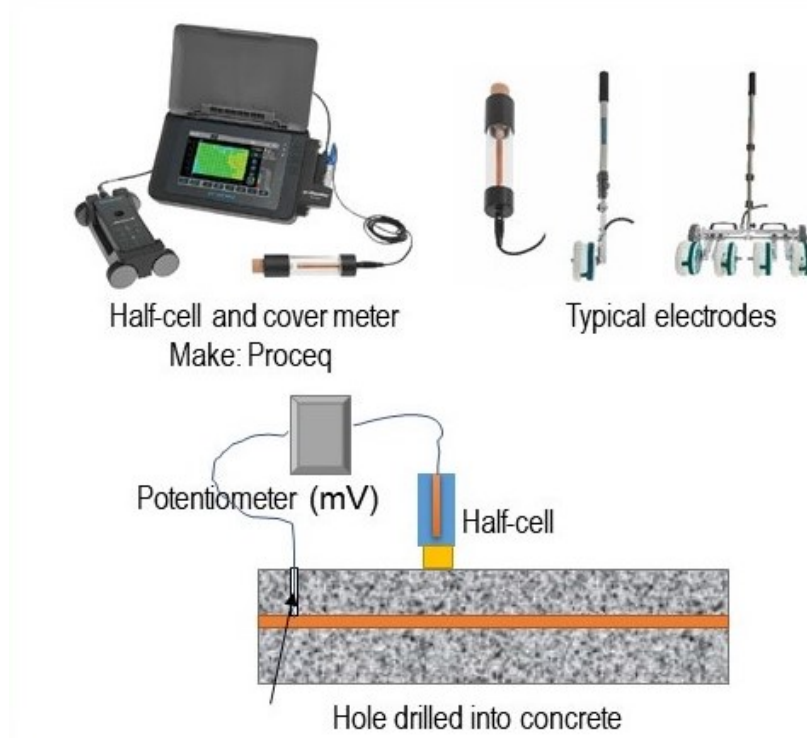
Typical half-cell equipment and arrangement of test on concrete.
